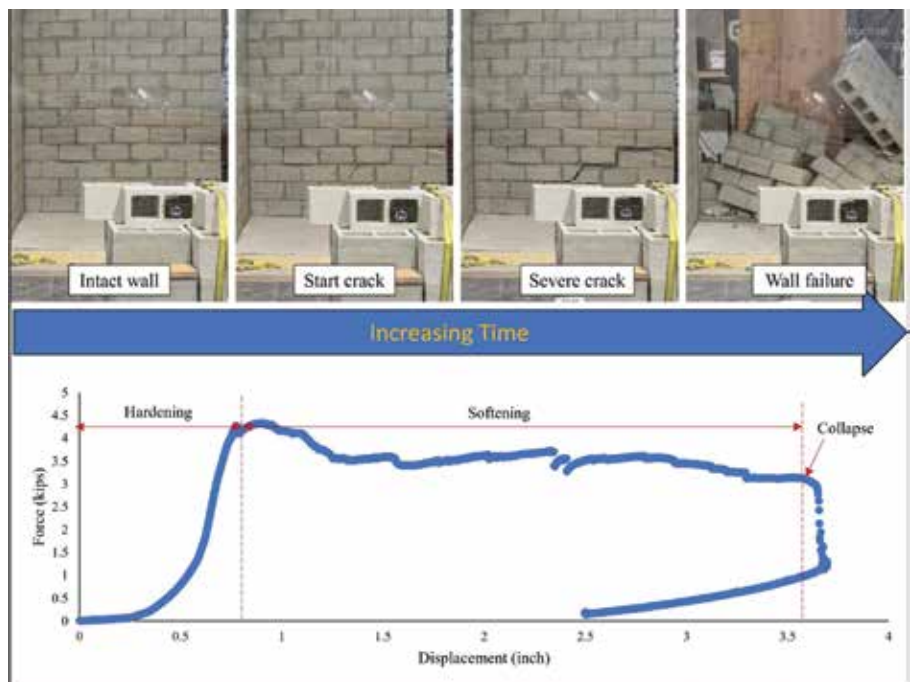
Wall test stages and experimental measurements (Note: 1 kip = 4.4 kN; 1 in. = 25 mm)
